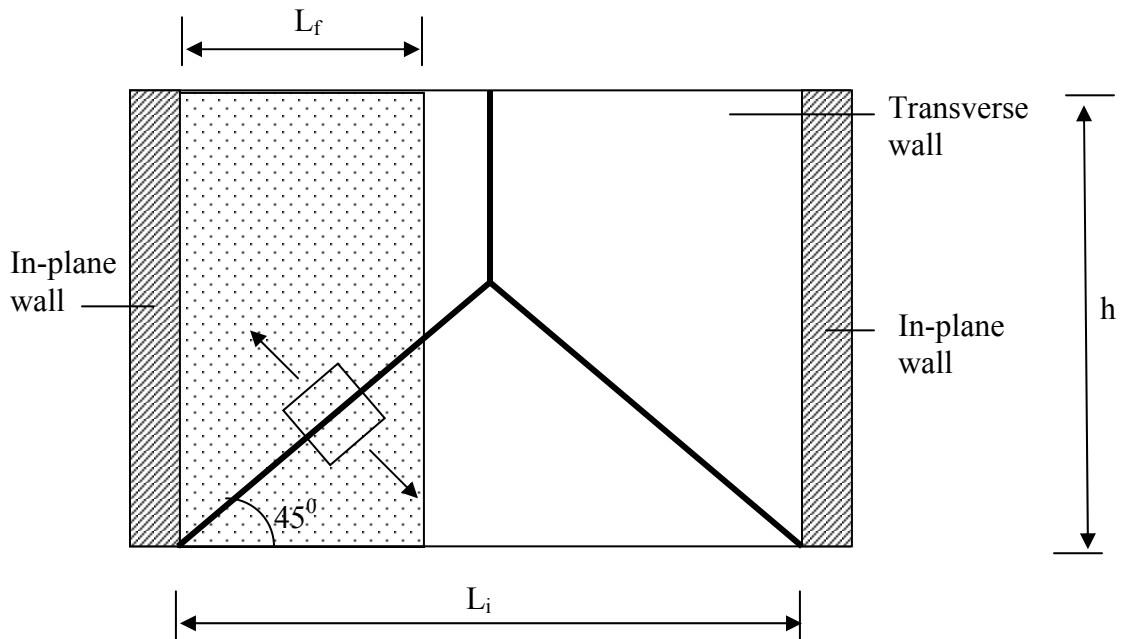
Elevation showing the effective flange width for the transverse wall in tension
